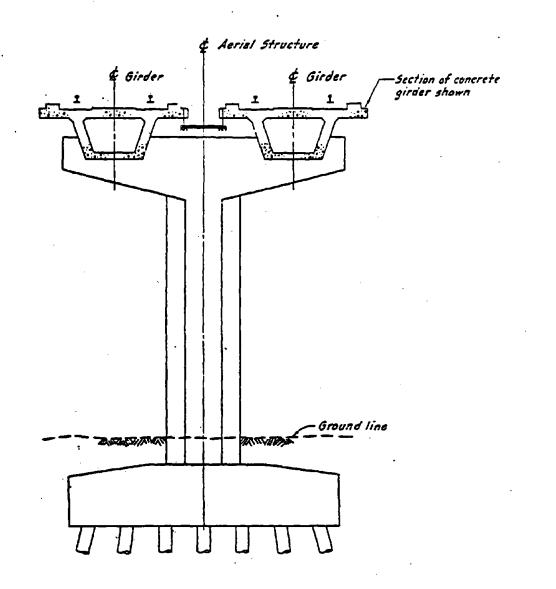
BART AERIAL STRUCTURE STANDARD TYPICAL SECTION
